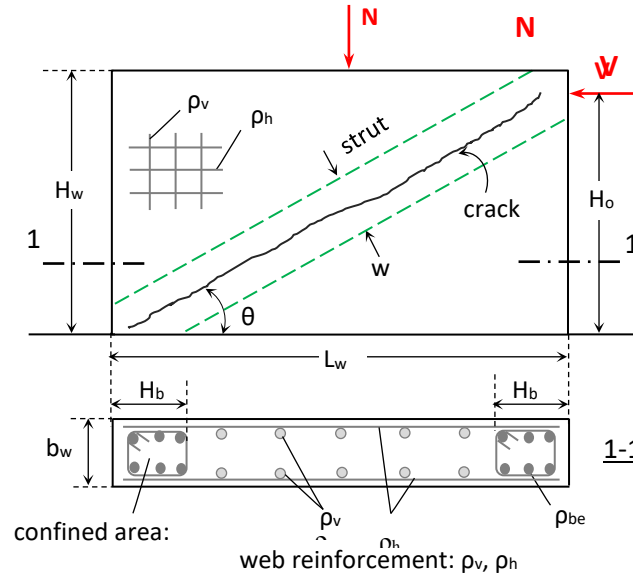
Geometric and reinforcement characteristics that affect shear resistance of a reinforced concrete wall (RC) with rectangular section. Symbols are explained in section 2.2
